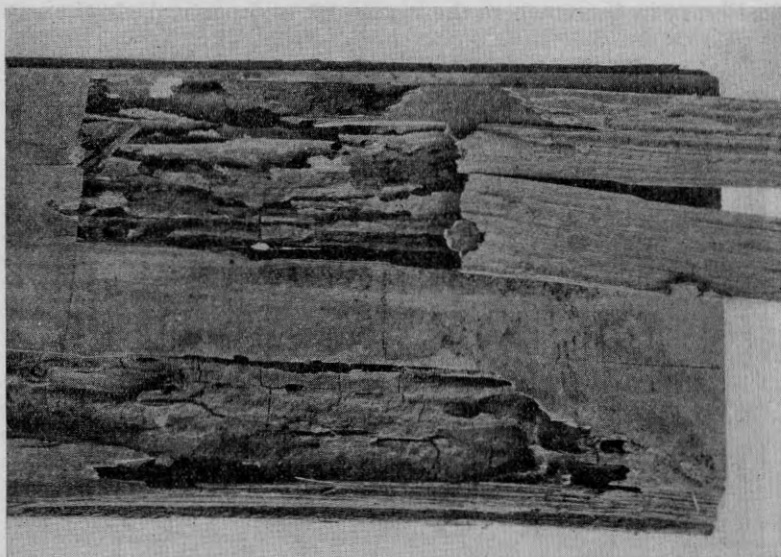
A near view of the back side of one of the sheathing boards of the Union Town Library, damaged by white ants.
